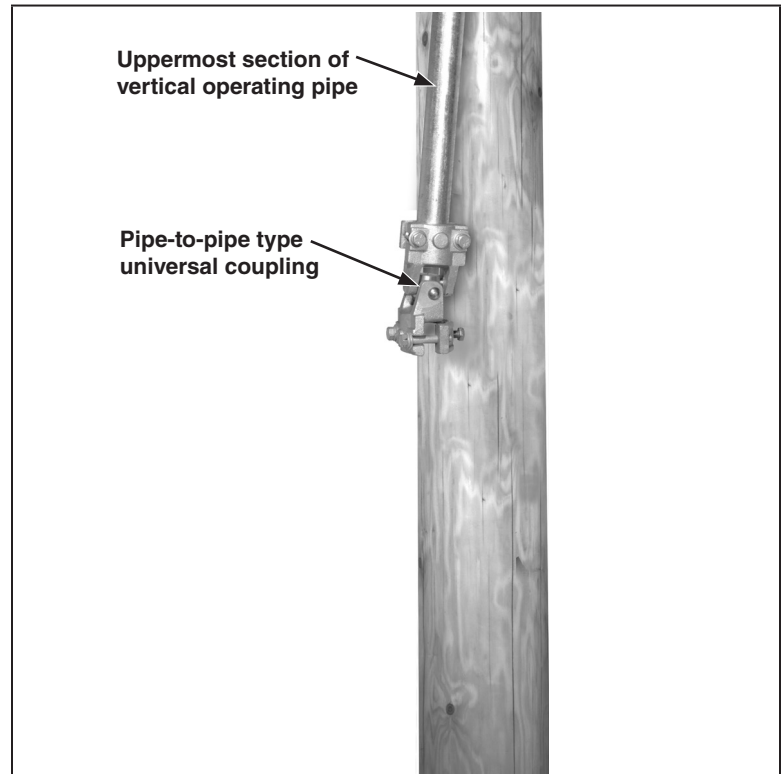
Attach a pipe-to-pipe type universal coupling at the lower end of the vertical operating pipe.
